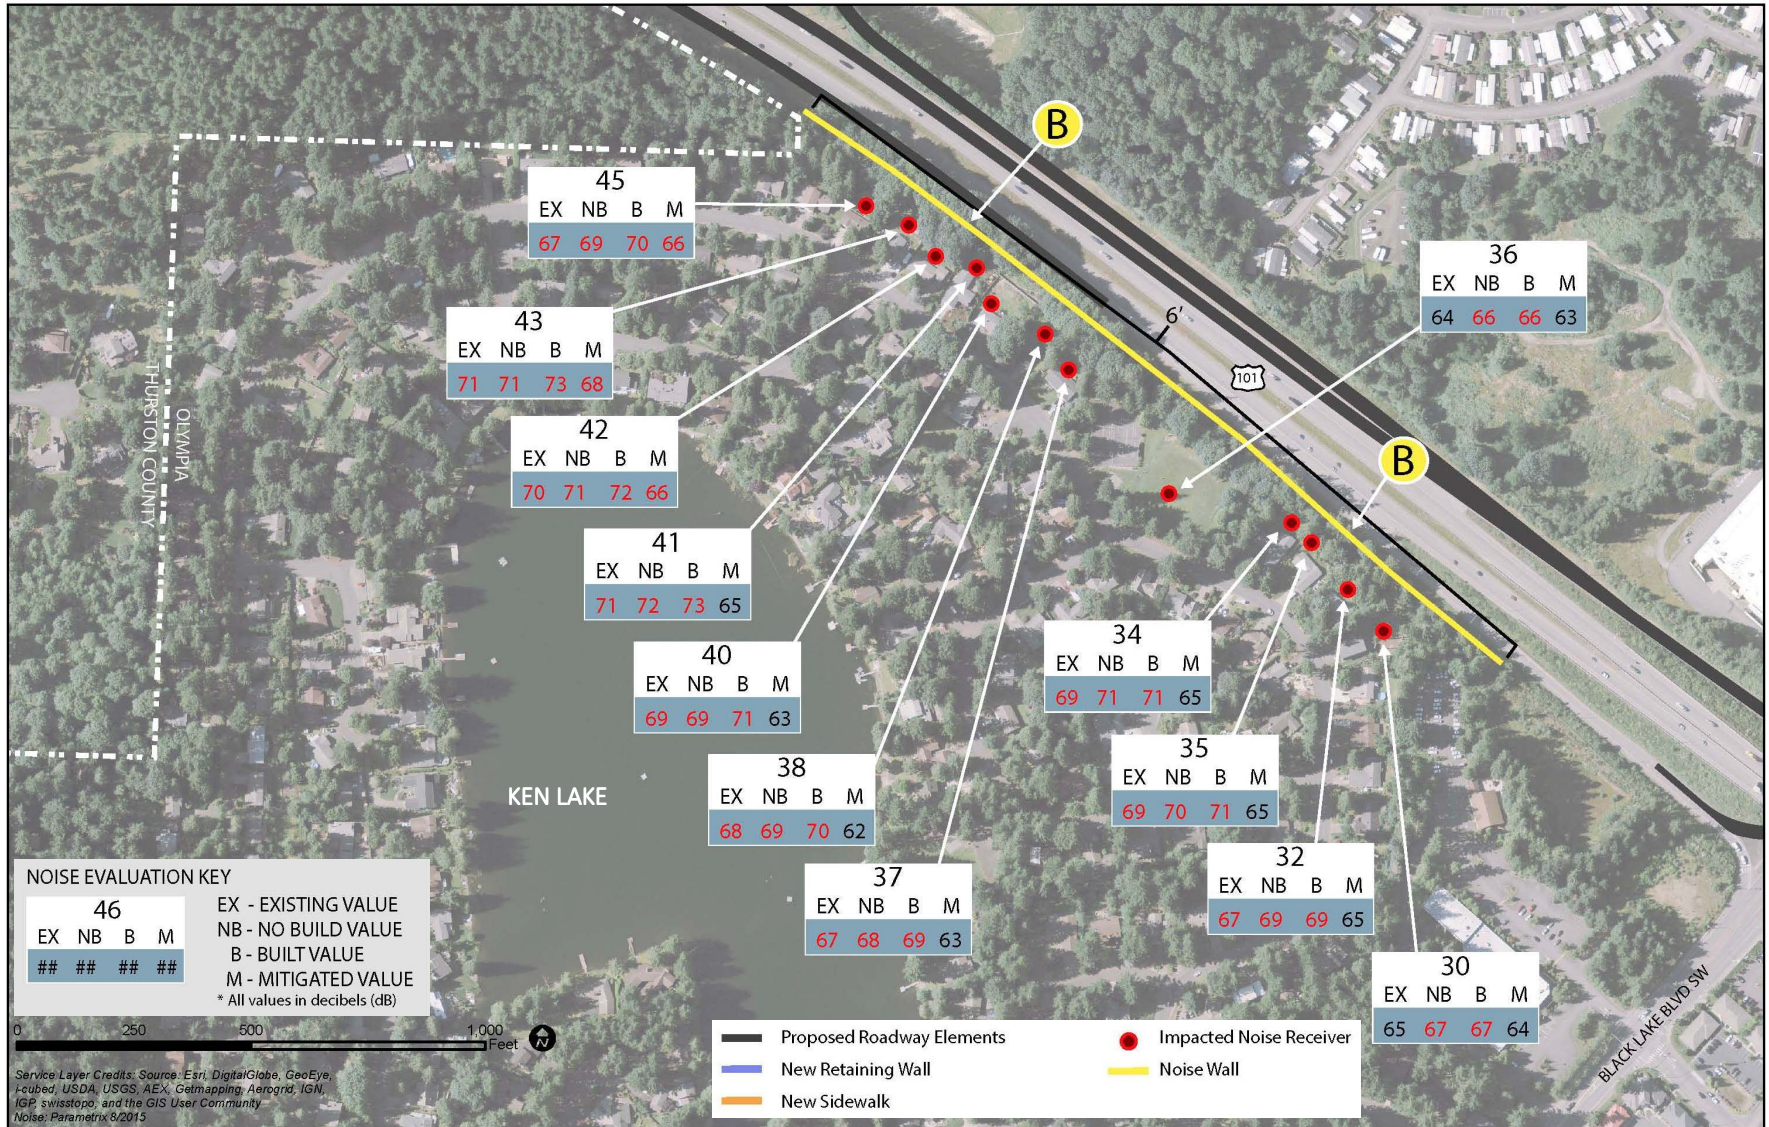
Proposed Noise Wall B – Ken Lake Area
